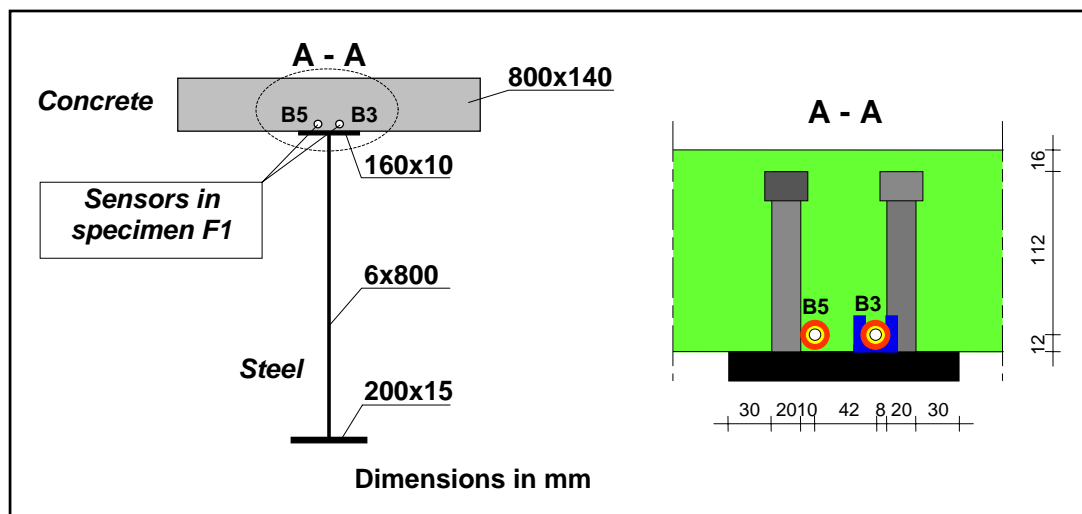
Cross-section and sensors placement of specimen F1
